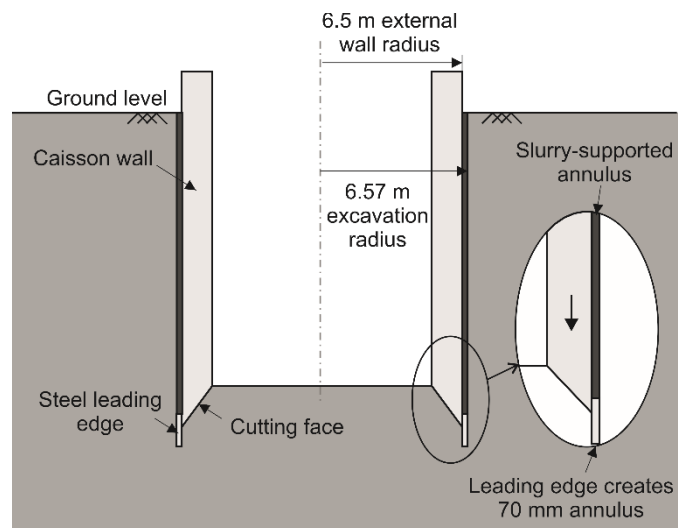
Schematic illustration of cross-section through caisson showing wall and excavation geometry
